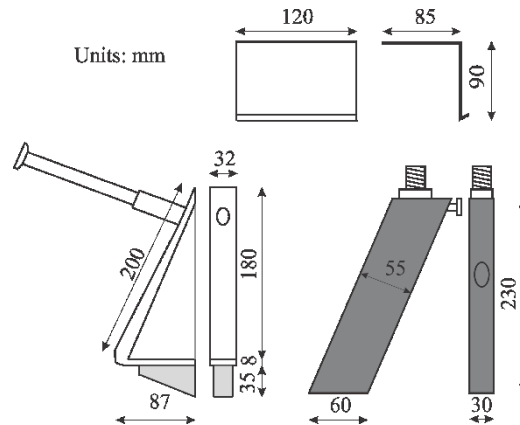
Geometrical details of components of the bottom cantilever connection
